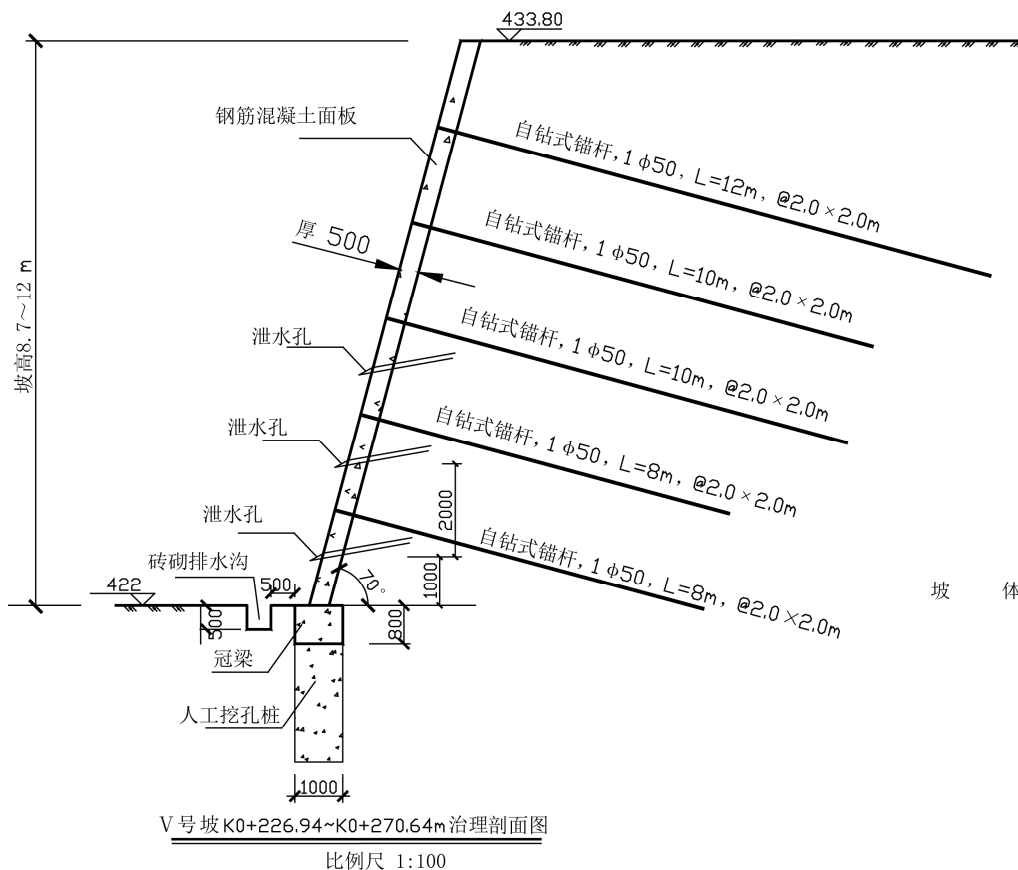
Cross-sectional view of No.5 slope (VK0 + 226.94-K0 + 270.64) supporting
